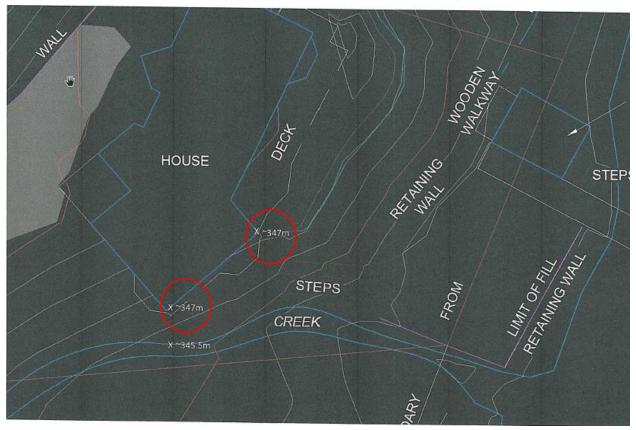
existing elevations from flood hazard assessment report (Dobson, 2019)
